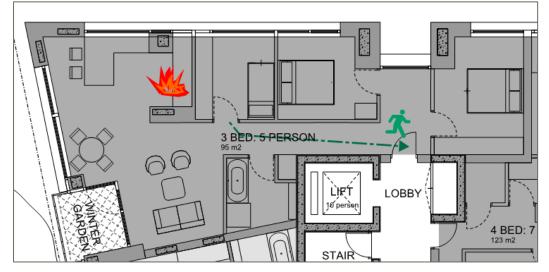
Example of open plan flat layout: kitchen is remote from escape route
